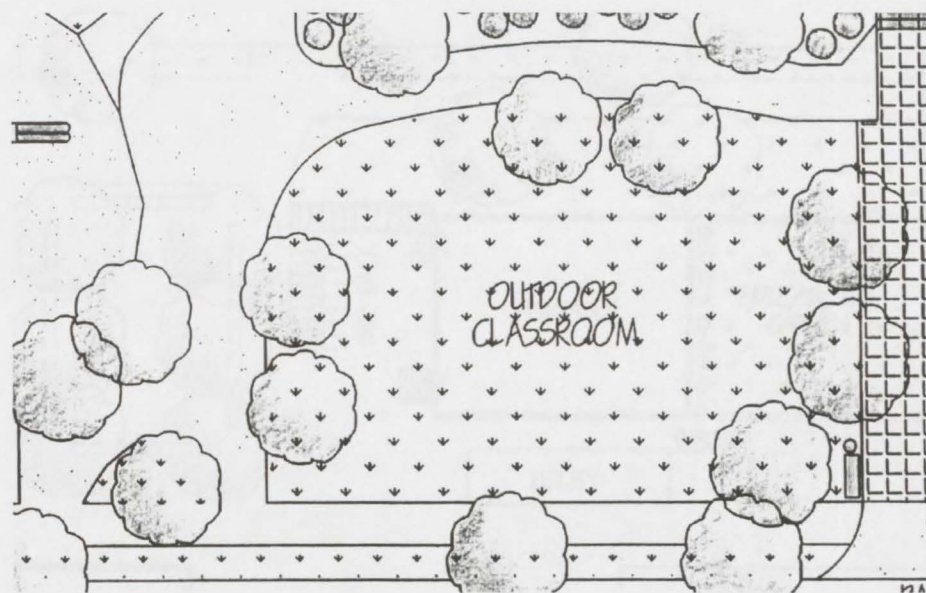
Proposed tree planting to create defined outdoor classroom spaces
